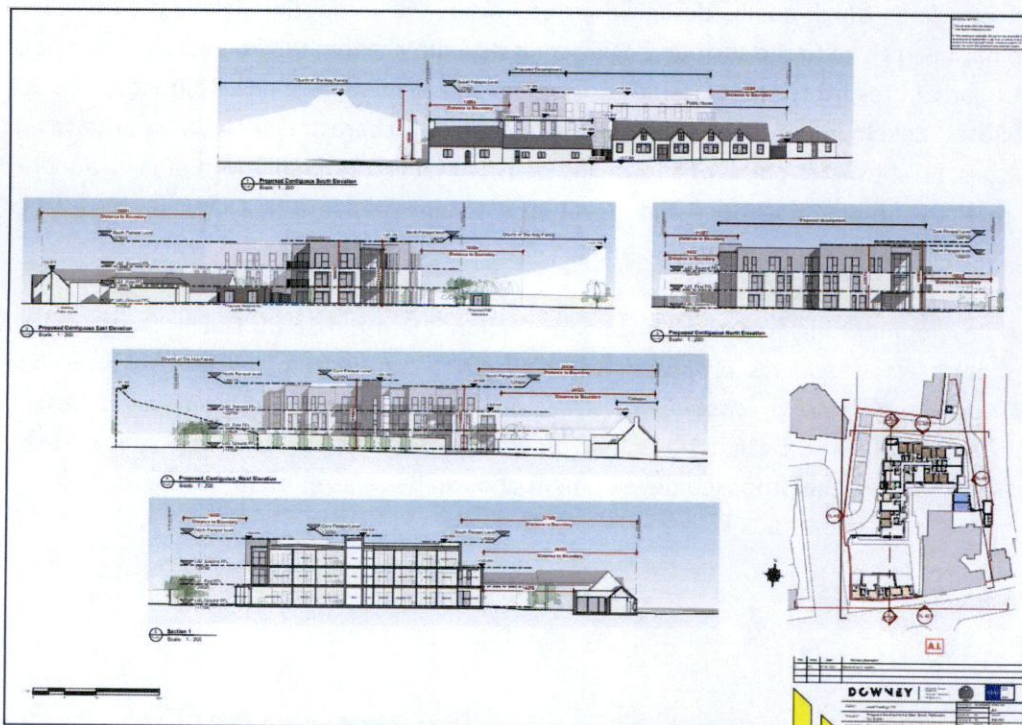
Extract of amended proposed development contiguous elevations at AI Stage.
